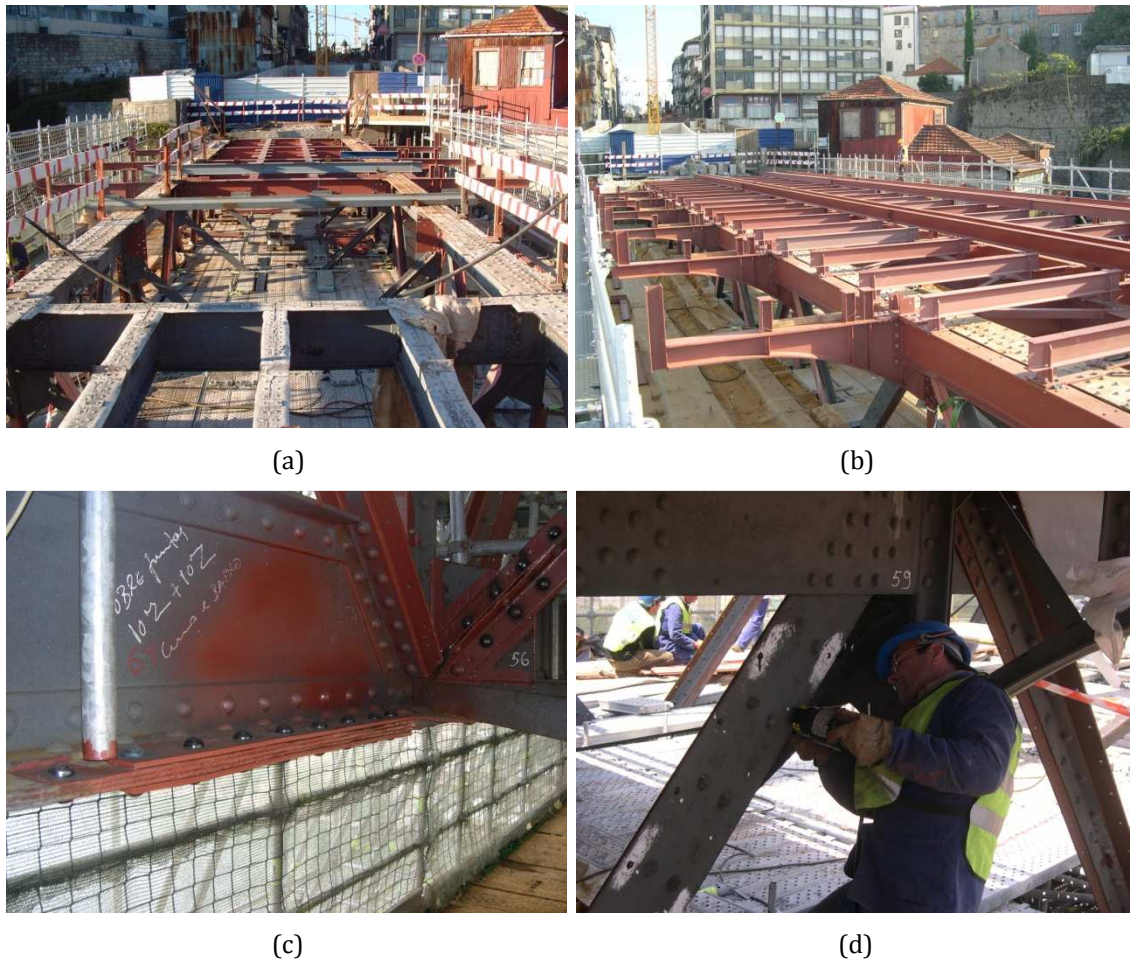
Rehabilitation and strengthening of the bridge (I): (a) removal of the old light-weight concrete pavement and supporting grid (cantilevers, crossbeams and stringers); (b) installation of the new floor system; (c) repair of a damaged lower chord flange; (d) drilling of an upper deck diagonal flange to attach the strengthening.
